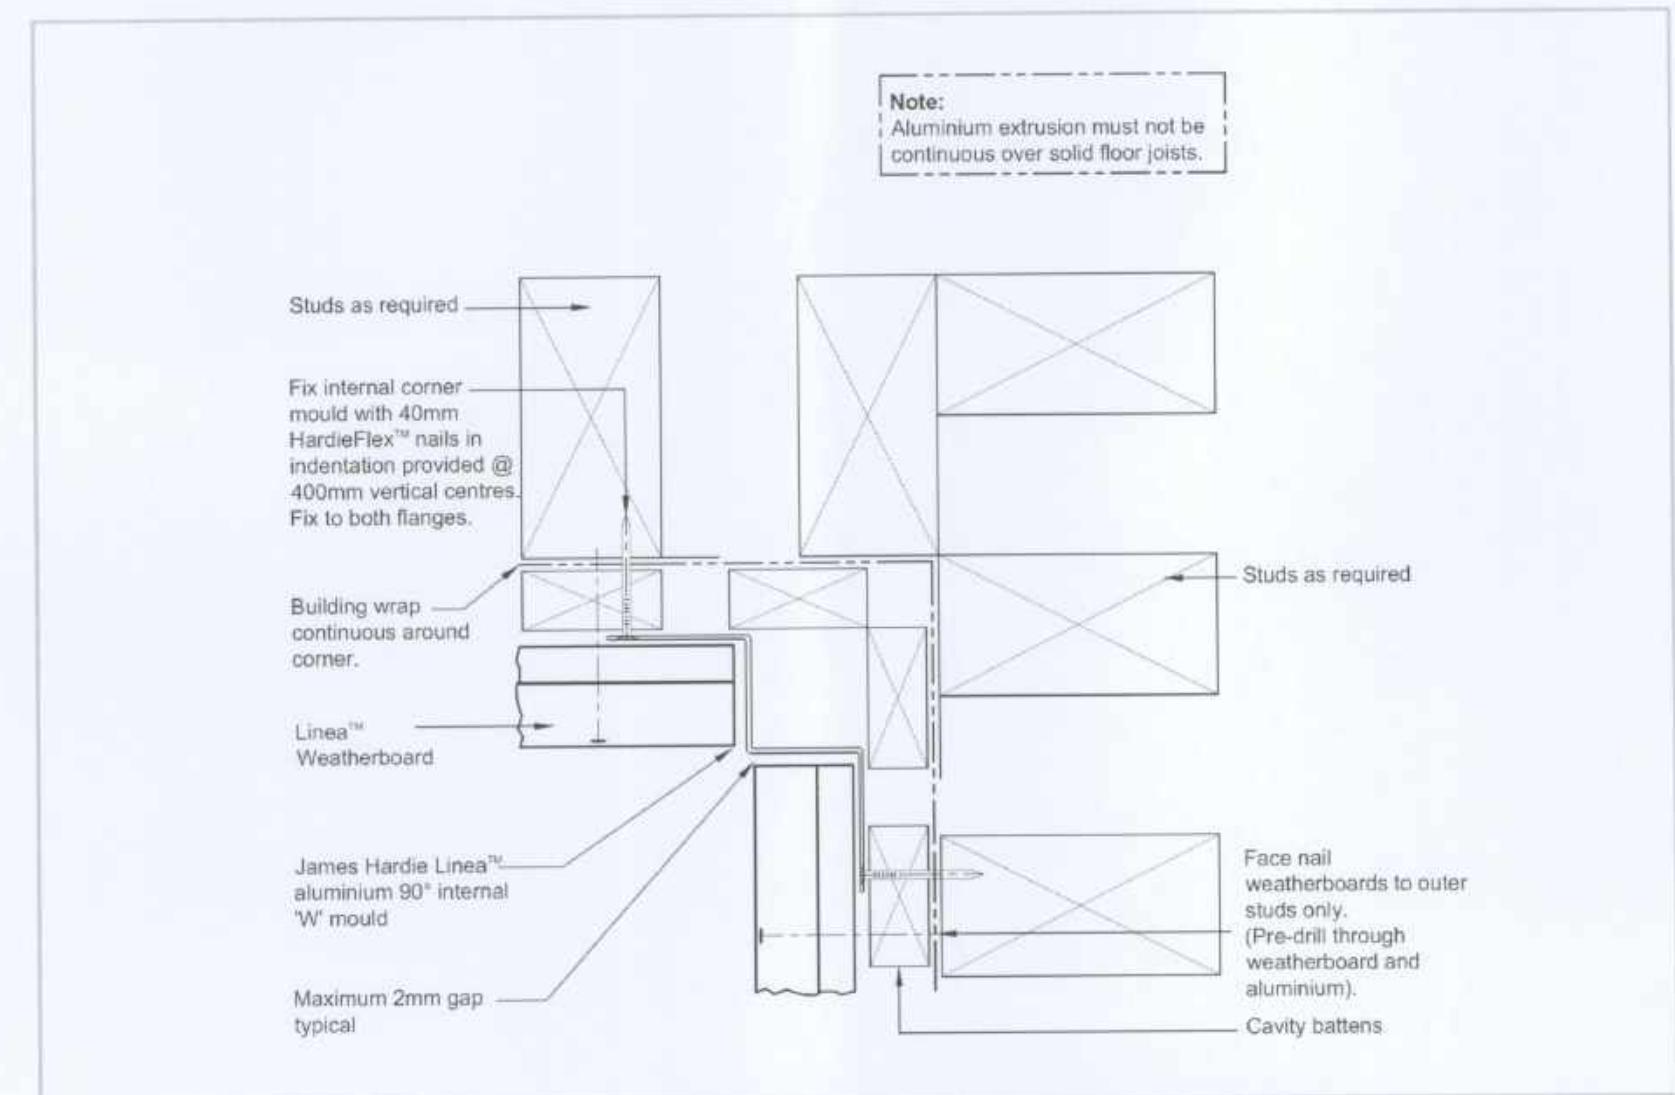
Cavity internal 90° aluminium 'W' mould corner
